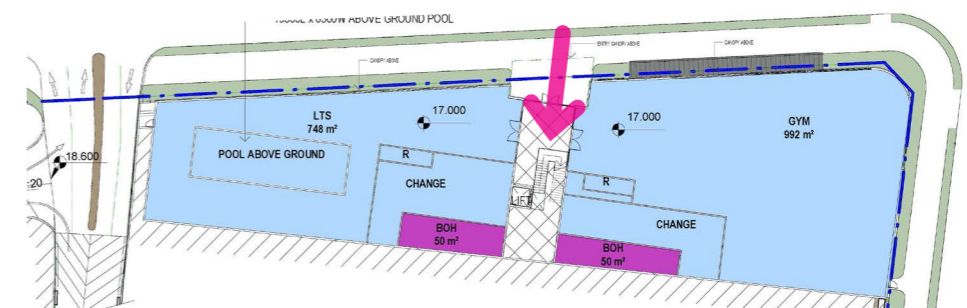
Summary Crime Prevention Assessment - Ground Floor Plan (BN Group/ TDP 2021).
